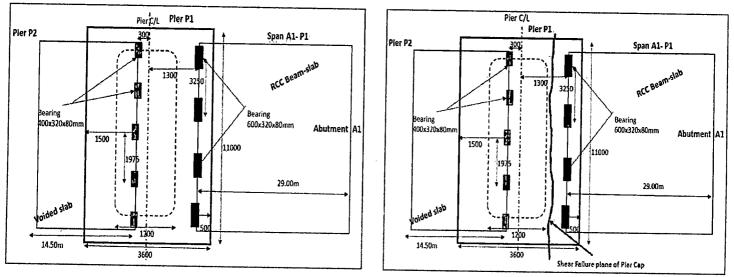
& 4: Typical details of Pier and Pier Cap of P1 and P2. Shear Failure plane of Pier cap P1 (Source: As Built Drawing & Site Measurement)
